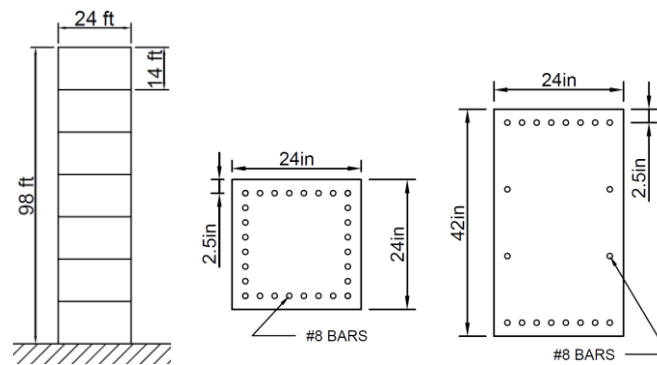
Geometry of a 7-storey building with cross sections of columns and beams
